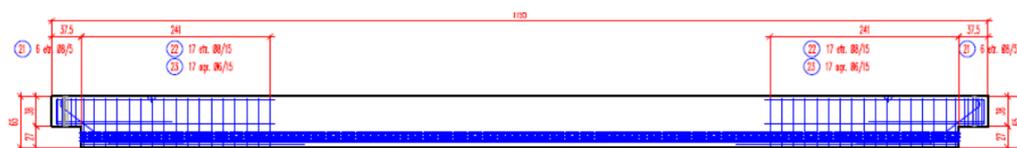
Precast prestressed concrete (fiber reinforced with no transverse reinforcement in middle area)
